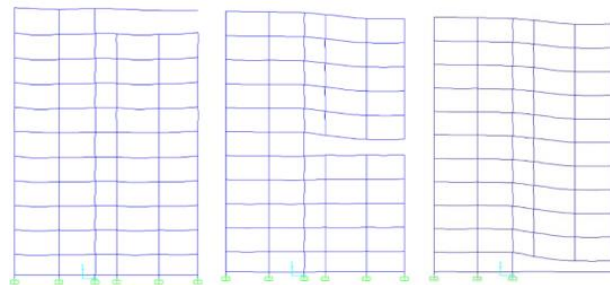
MRF Column Removal Scenarios at Bottom Floor, Center Floor and Top Floor
